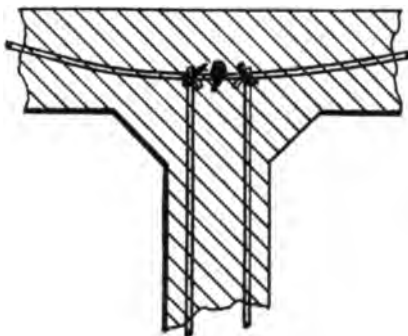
OUTSIDE WALL CONNECTION OF REINFORCEMENT.
